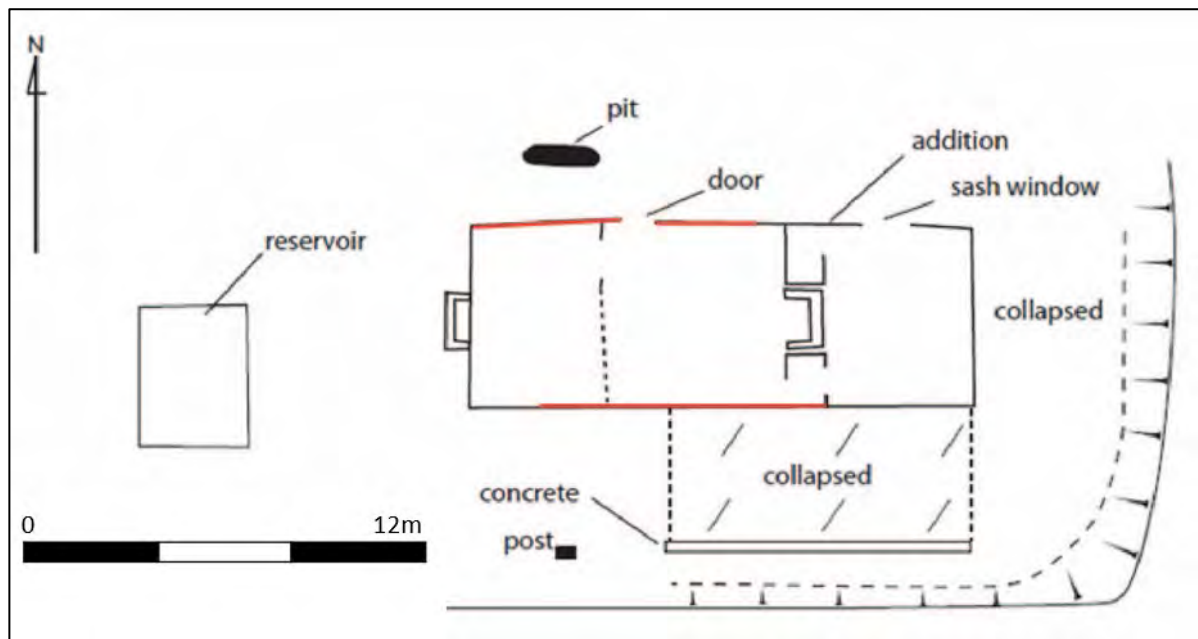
Site plan from site record form. Walls highlighted in red have since collapsed.
